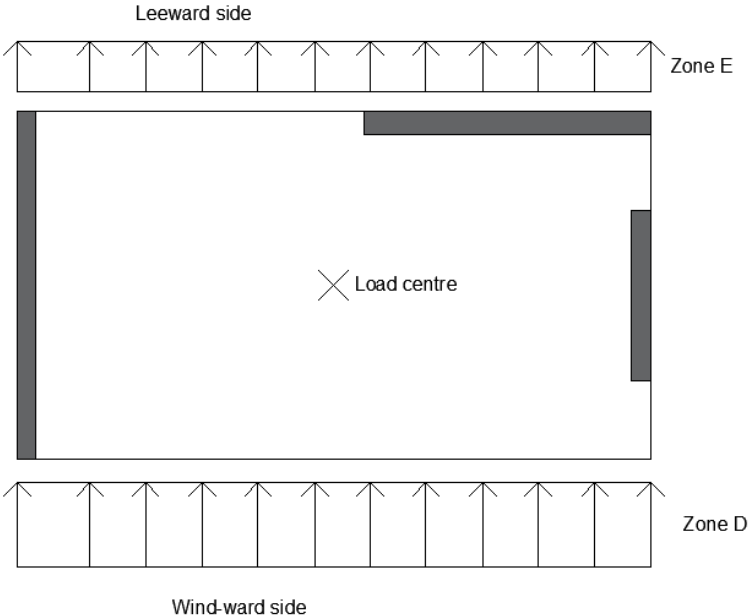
Symmetric wind load over the width of a building. Grey marked are shear walls.
